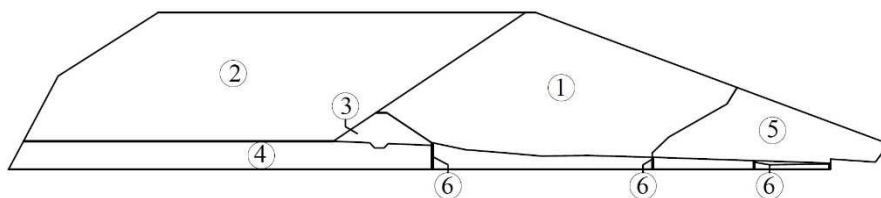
Cross-section of the tailings dam: 1) downstream sand embankment, 2) tailings pond, 3) symmetric, homogeneous starter dike made of graphite shale, 4) gravel with variable thickness (8-10m), 5) downstream rockfill support, 6) drainage carpet with drainage pipes
